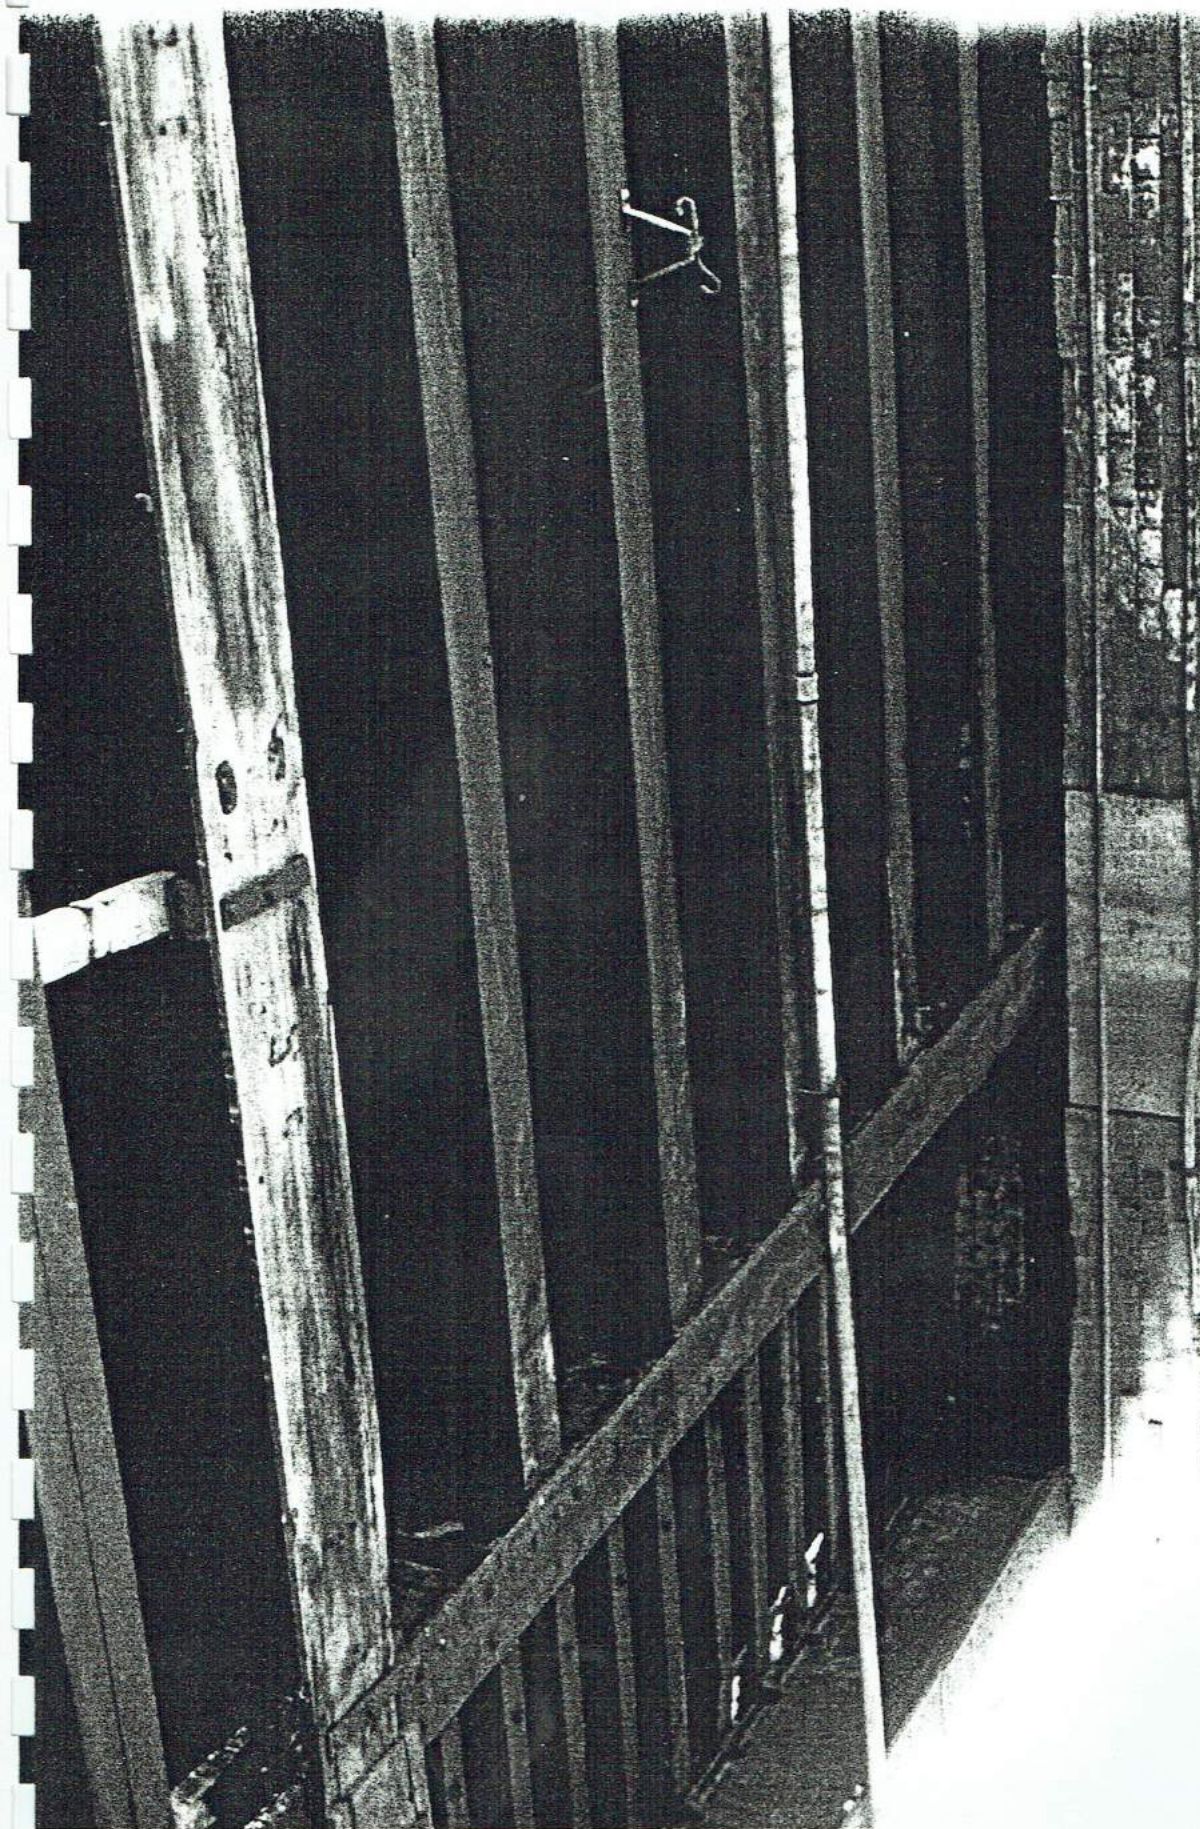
PHOTO OF PLATE GIRDER BRIDGE BEAM. FIGURE 9.
